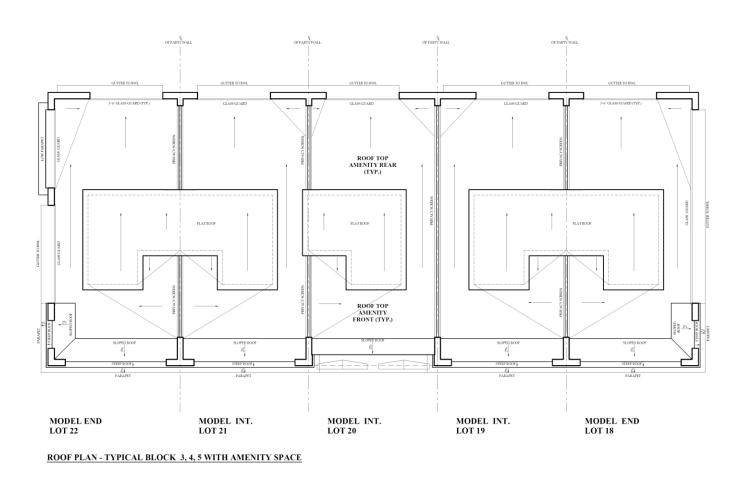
Roof Plan Typical Block 3, 4 and 5 with amenity space, Sheet A5 Roof (FBP Architects Inc., September 1, 2023)
